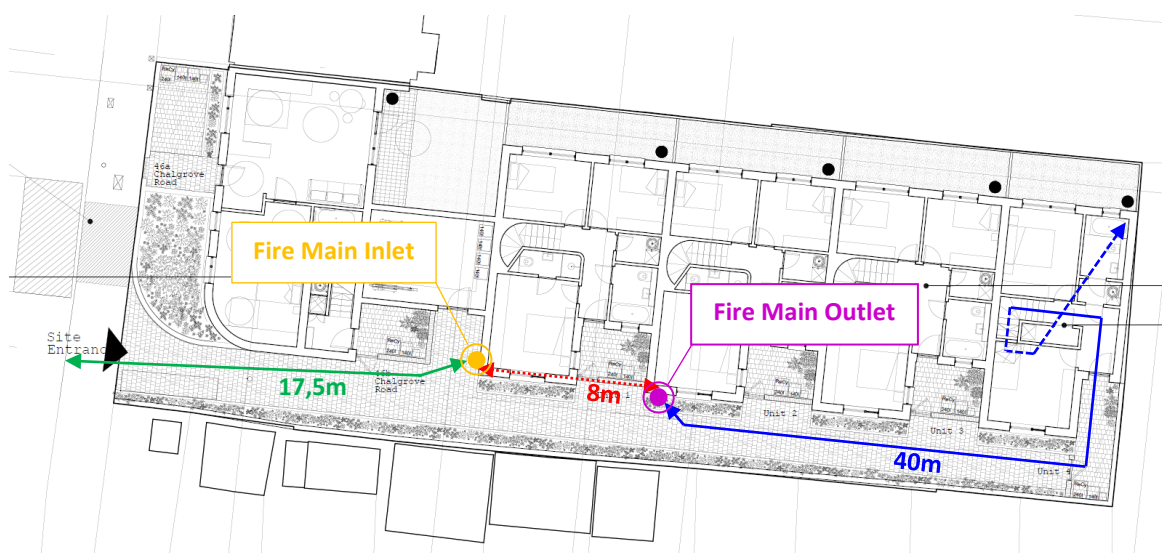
Proposed Ground Floor Plan with fire main inlet and outlet to provide efficient access and facilities for the fire service
